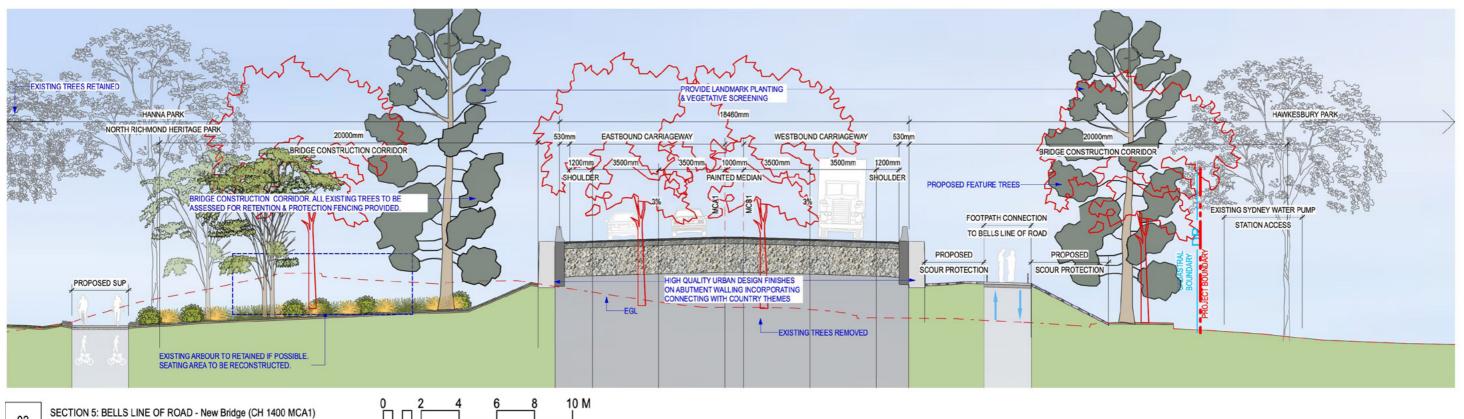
Stage 2A urban design sections - sheet 1 of 4
